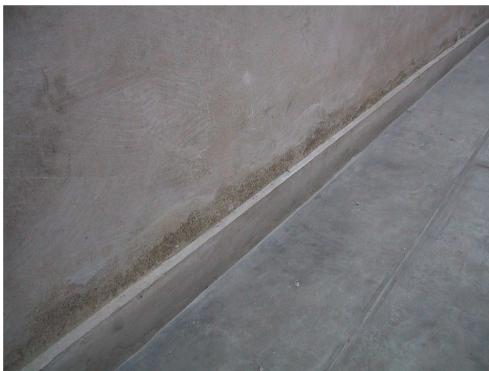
Damaged lime plaster/paint system at the base of a corridor wall (2003-12-04)
